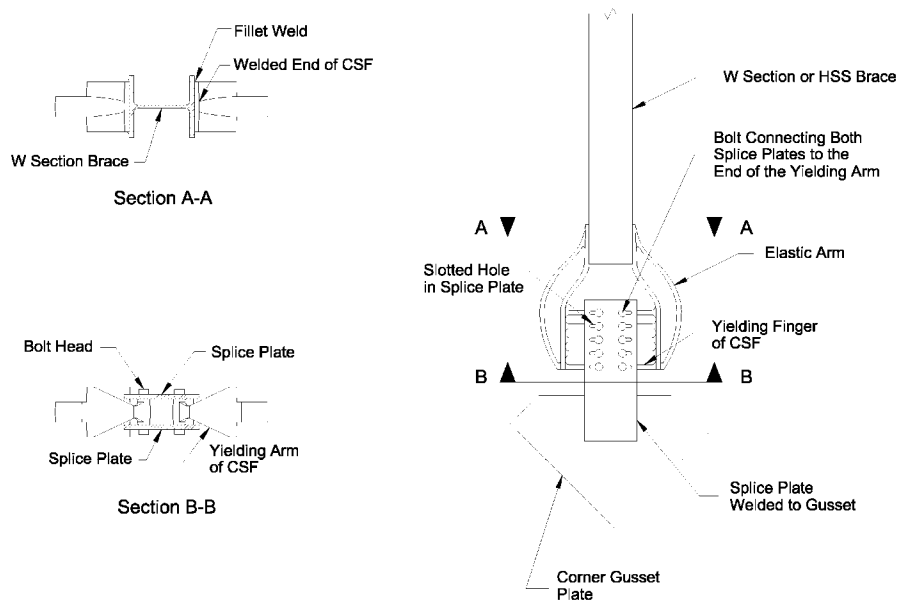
CSF-brace assembly connection to a typical corner gusset plate
